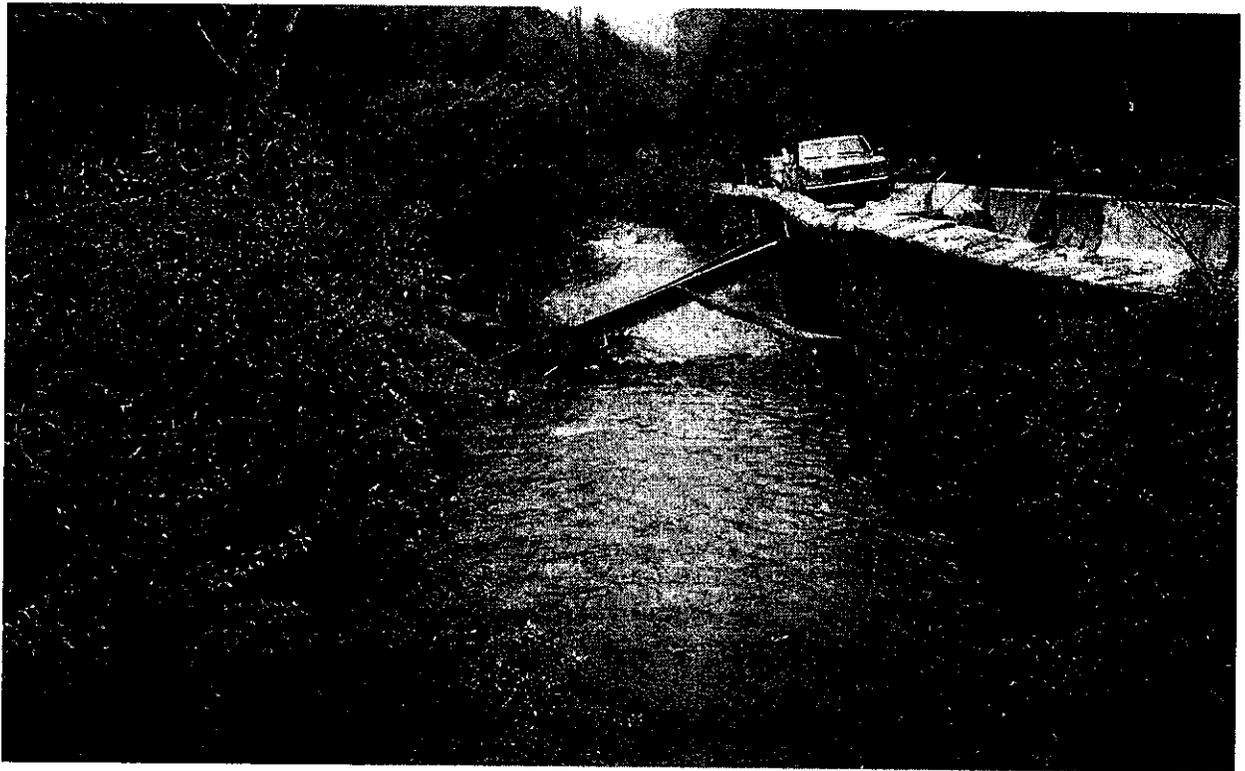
Photograph of the retaining wall facing downstream on North Branch Basket Creek.
